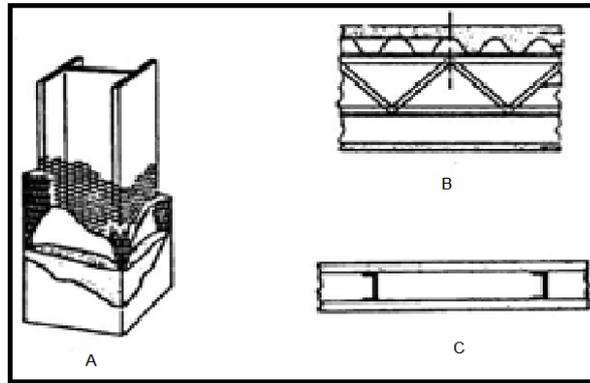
Membranous protection against fire (a: column, b: false ceiling, c: walls or separators)
